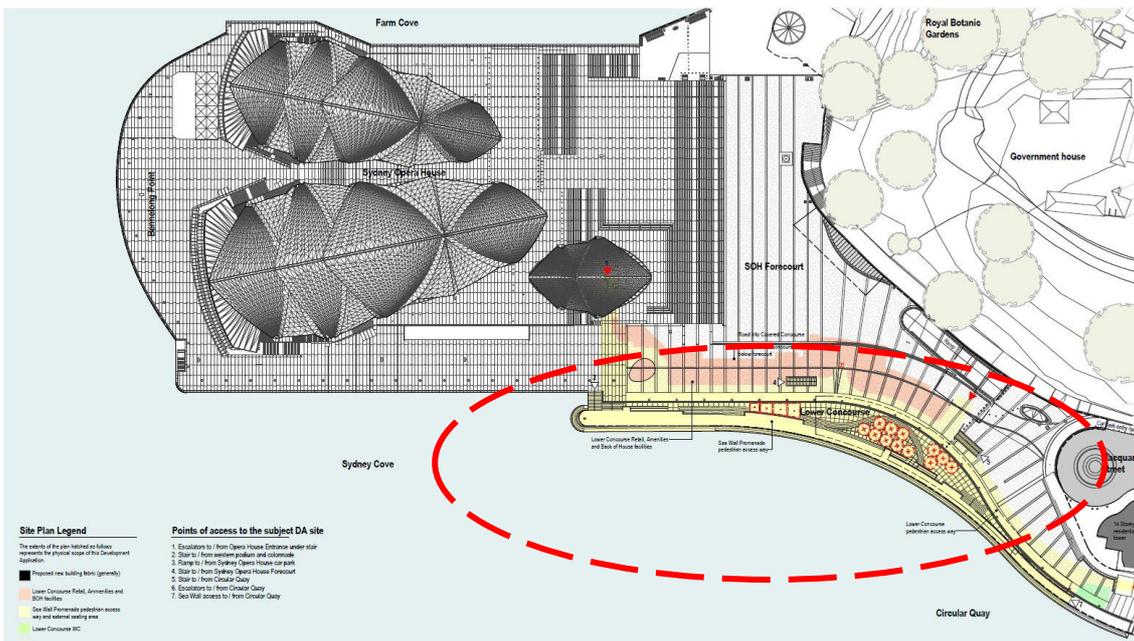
Location plan showing current operations and general area of proposed works (Source: H&E Architects).
